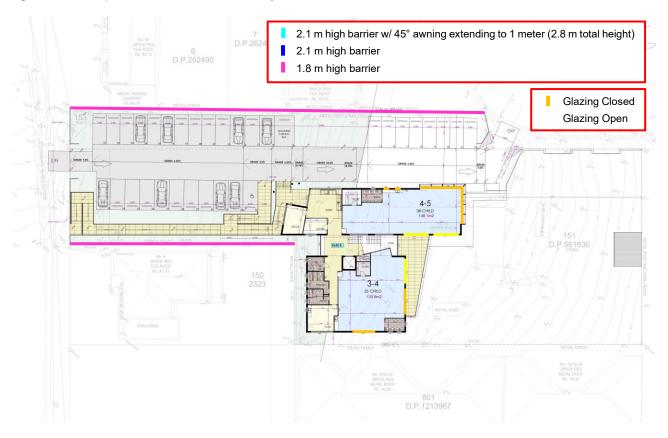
Proposed Child Care Centre Layout – Ground Floor
